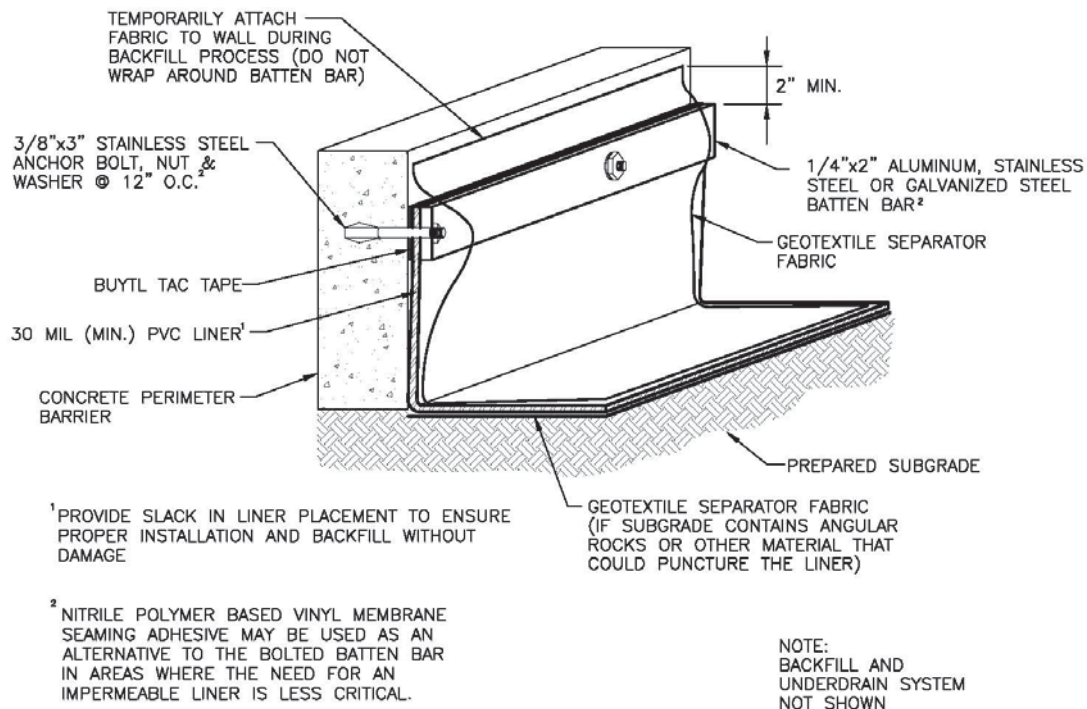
Geomembrane Liner/Concrete Connection Detail
